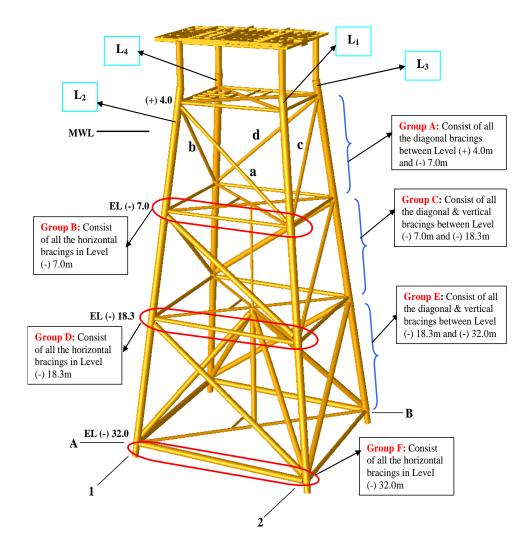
Jacket Structure Diagram showing Bracing Member Groups and Support Legs
